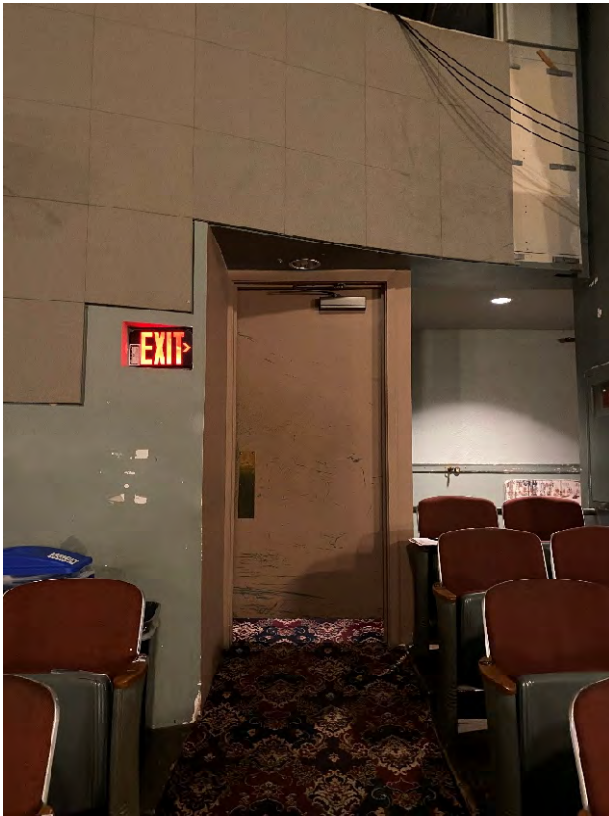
First floor auditorium southwest entry: nicks and paint loss in wall, material loss at bottom corner of wall.
